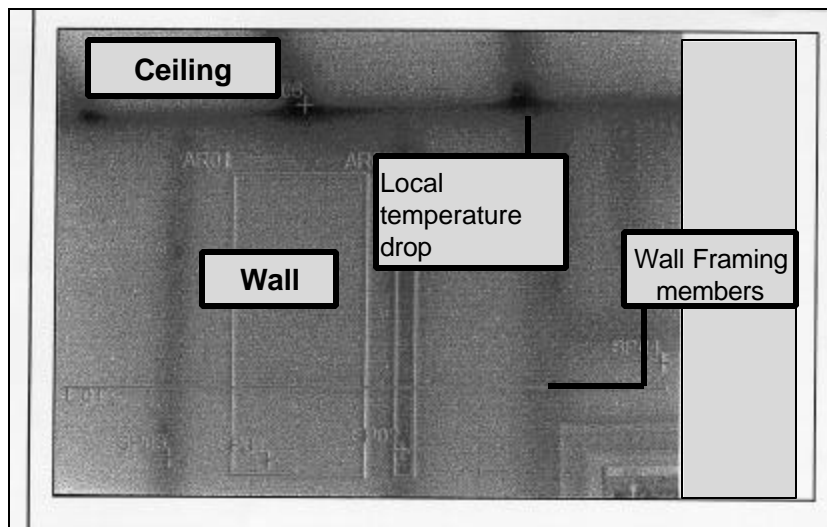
Thermal image of ceiling wall connection in a wood framed home showing a lower temperature band.
